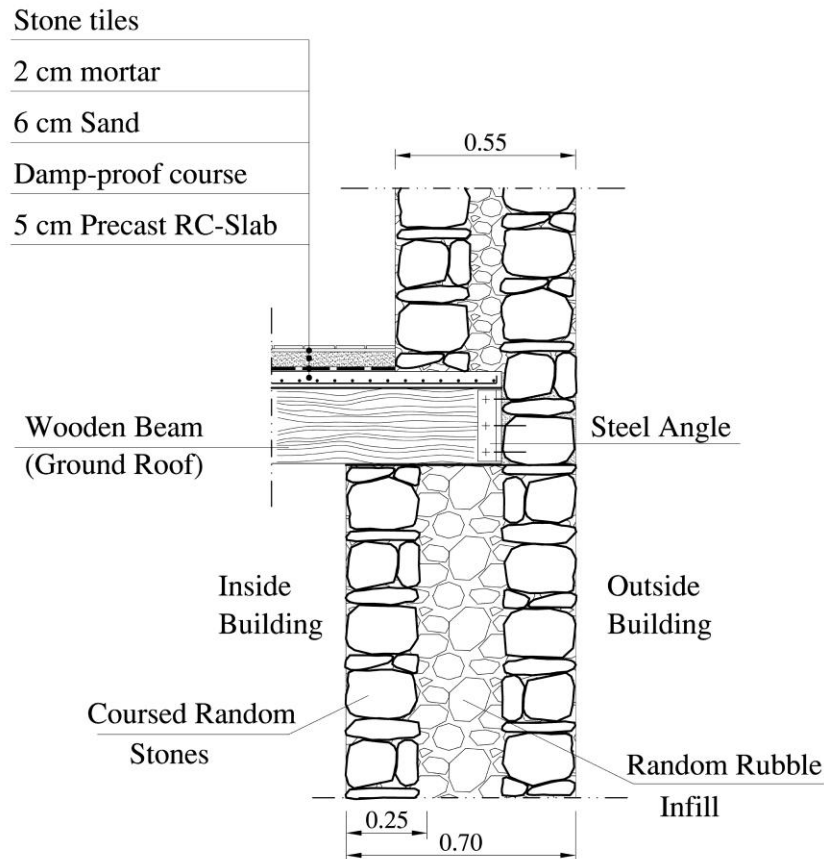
Detail of reconstruction of masonry walls and wooden roof, including the embedding of Precast RC slabs.
